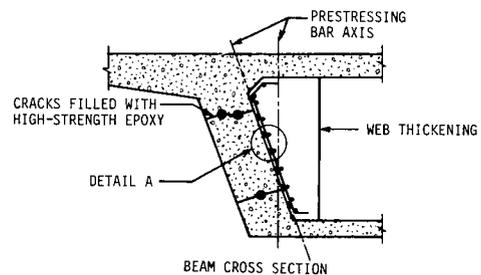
Details of web reinforcement to strengthen box beam in shear.
